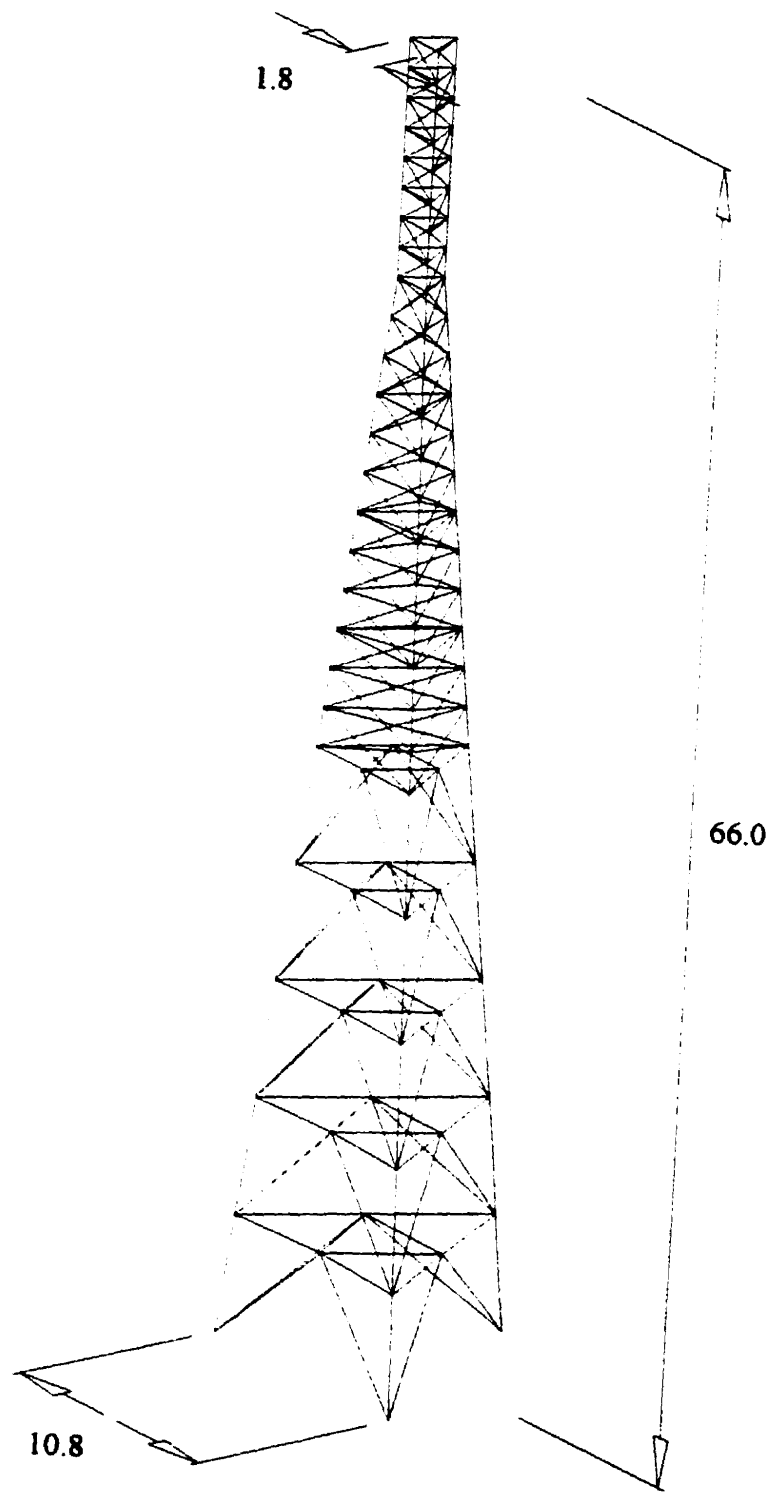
Layout of tower TC3 (dimensions are in m)
